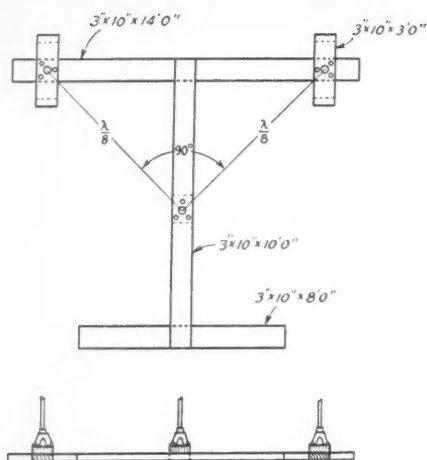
Plan view of the supporting platform for a three-element 14-Mc. fixed "rotary" beam set on a flat roof. The frame can be held in place by sandbags.
